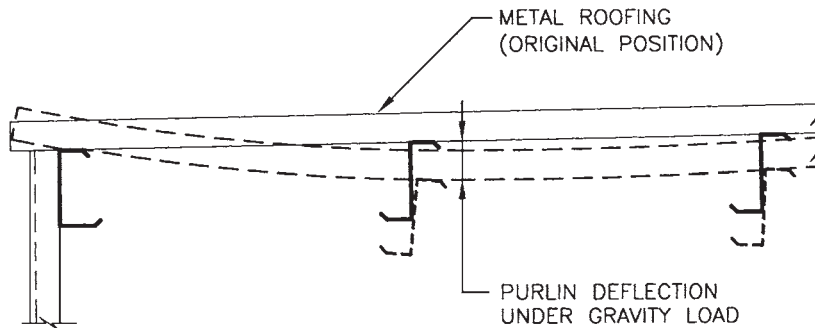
Shallow roof slope, such as $1/4:12$, may be insufficient for proper drainage when purlins deflect under load.
